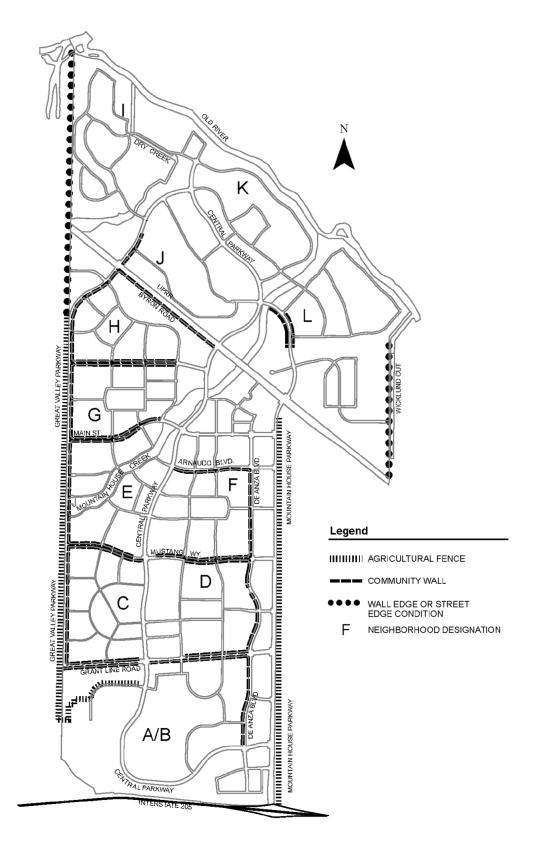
COMMUNITY WALLS LOCATION PLAN
